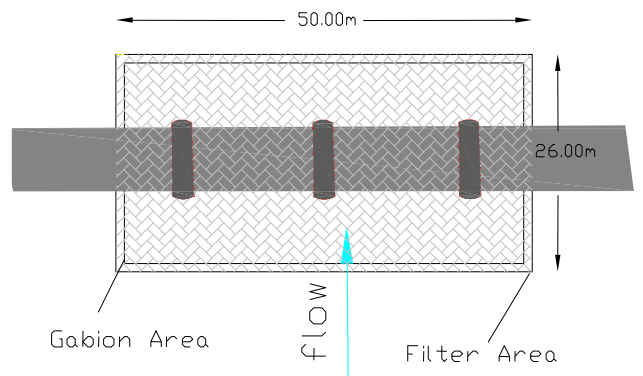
The layout of Reno mattress at Asalem Bridge piers
